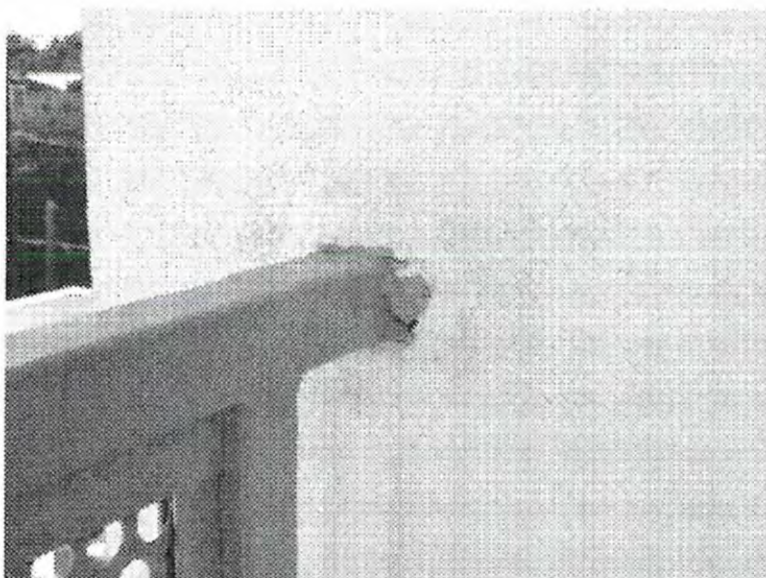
Corrosion of railing behind stucco resulting in staining at balcony on Building D. Sealant not provided around penetration through stucco.
